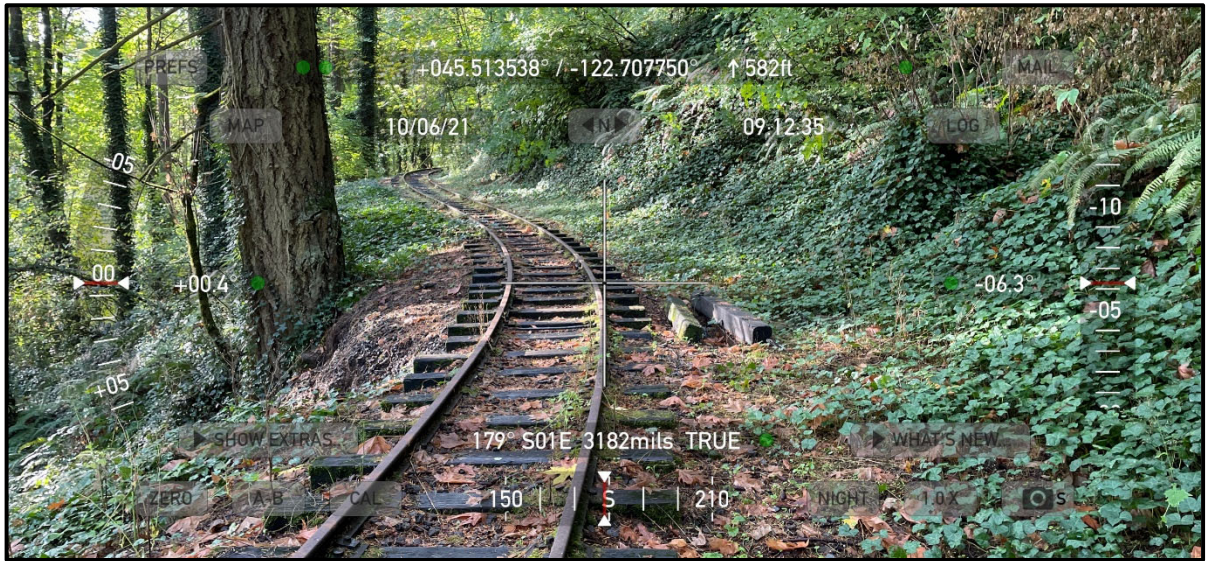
Alignment near Crib Wall 3 and Culvert 6 looking south
